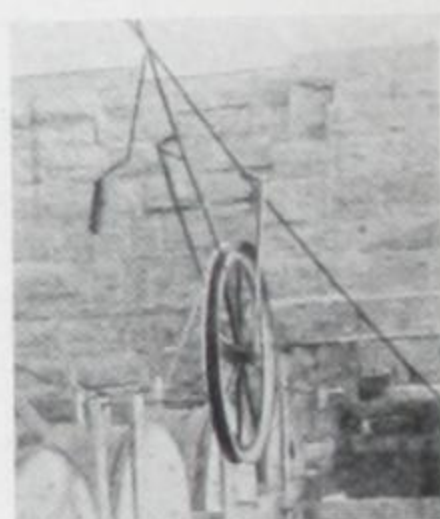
The Sheave Assembly Spinning Wheel used on the George Washington Bridge
